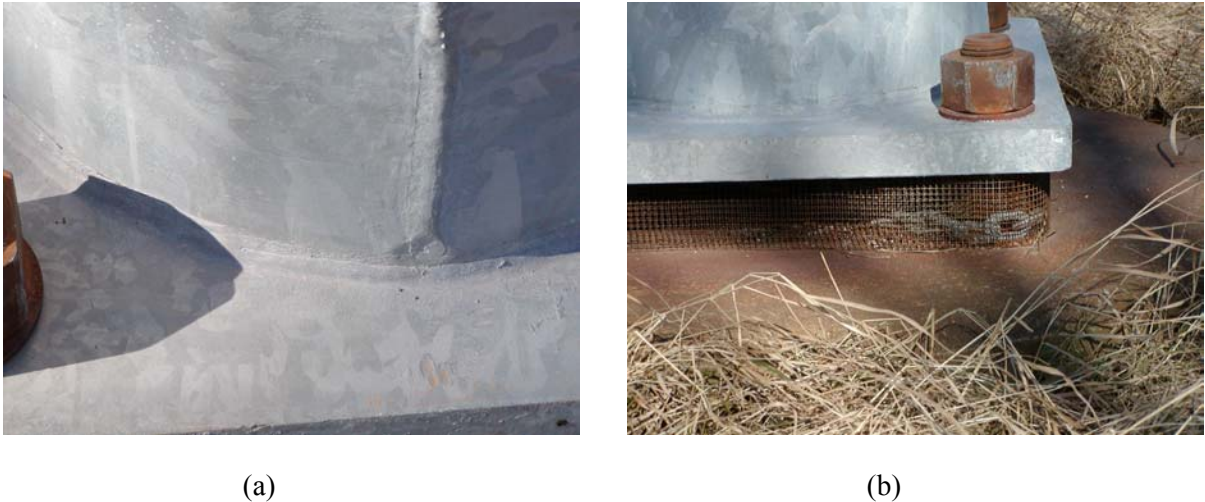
Initial Condition of HML-40-061 Luminaire Support: (a) Base Plate Weld; and (b) Anchor Rod Condition.
